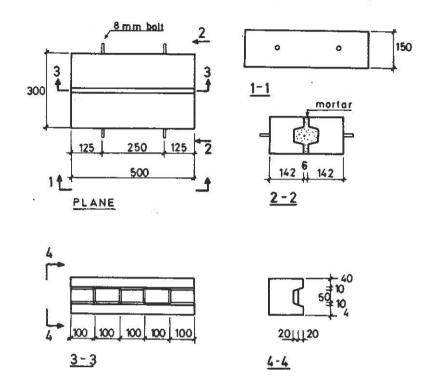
Test specimen of prefabricated concrete element (wall components)
